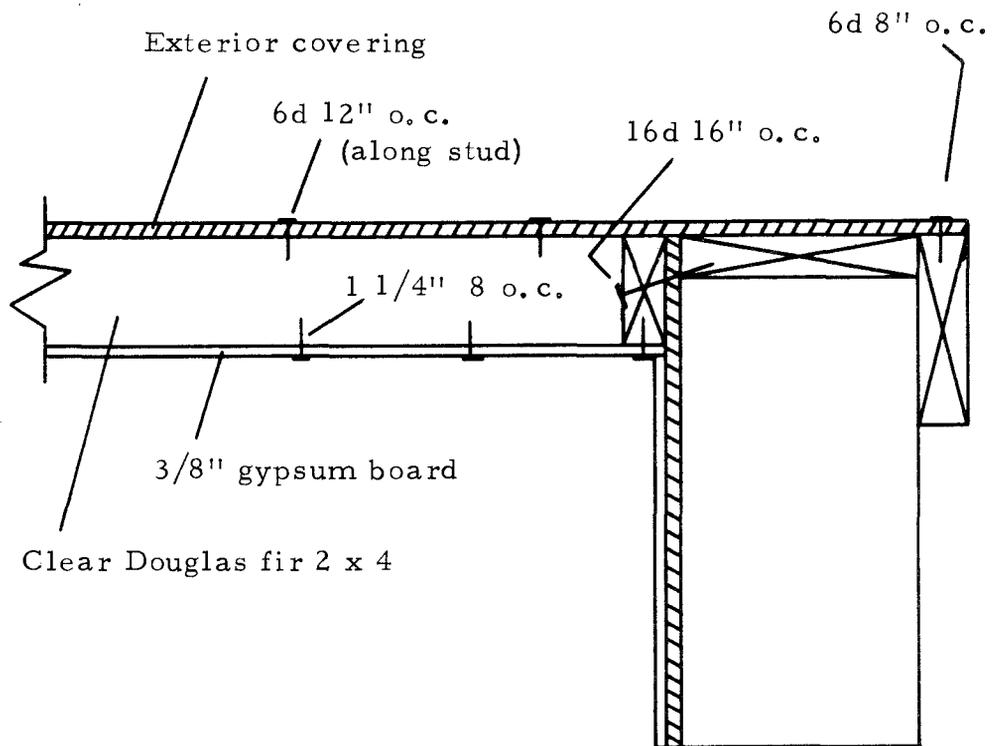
Wall construction type I with exterior covering overlapping floor header and conventional nailing.
